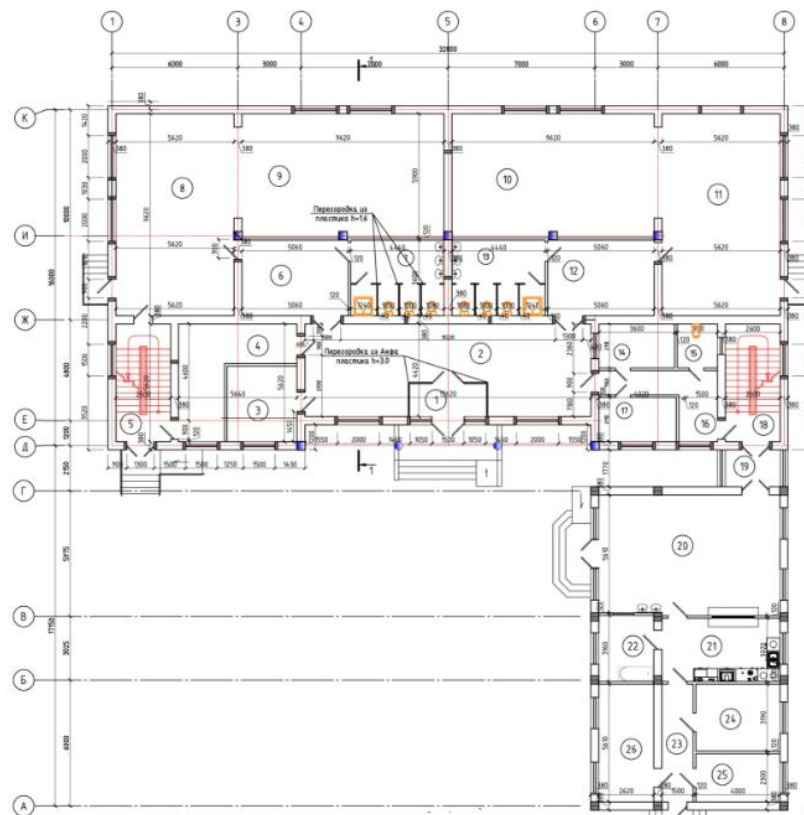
The 1st Floor Plan of Dmtt No. 41.
